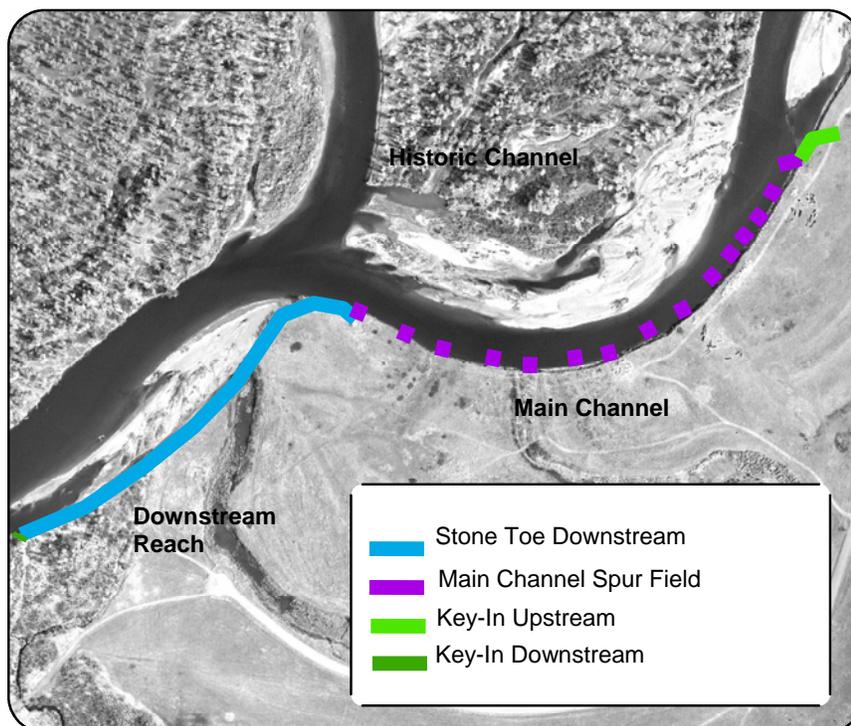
Aerial view of bank section for Alternative 5 showing approximate location of stone spur construction on main channel, stone toe, and revetment downstream
